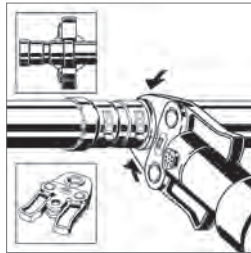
Place the Megapress press jaw (\leq DN25) around the press connector. Ensure that it is properly fitted. Carry out the pressing until the press jaw is completely closed.
